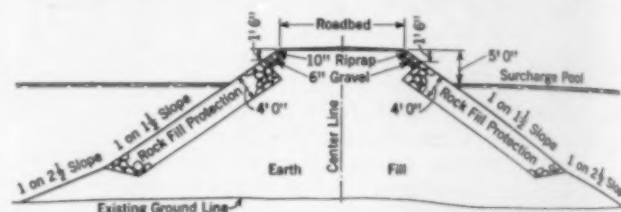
TYPICAL EMBANKMENT WITH ROCK-FILL PROTECTION
